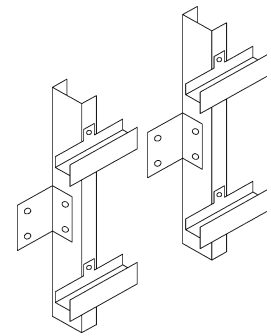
Subframe and fixing kit type 3 (without horizontal profile)
